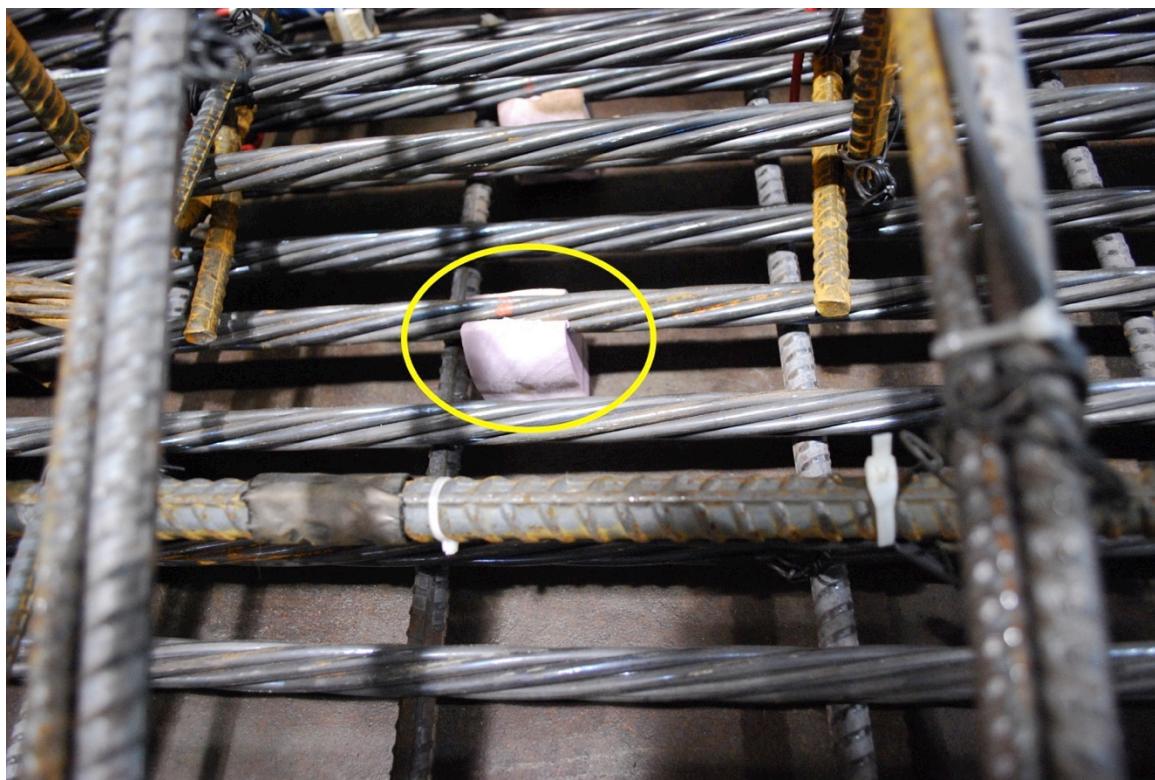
Access foam block for installation of strain gages on prestressing strands
